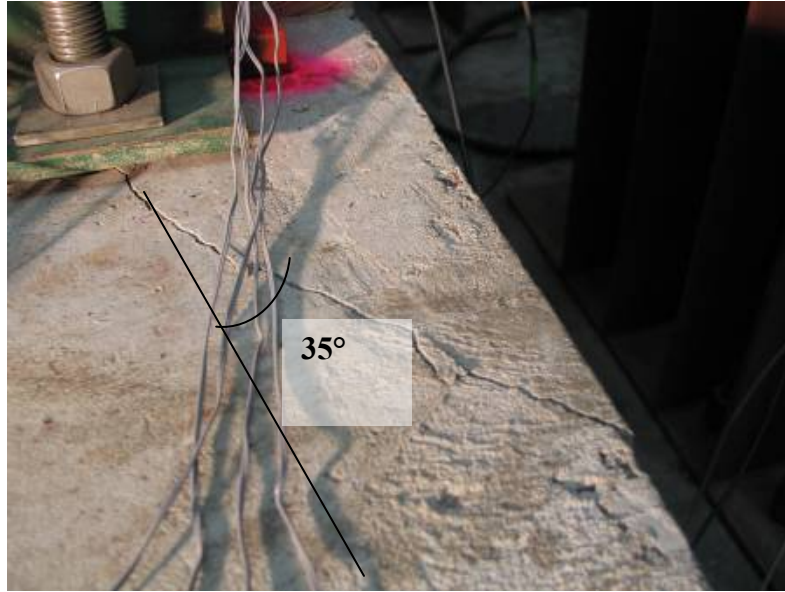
Failure surface of reinforced concrete cap beam subjected to shear loading with bolt close to edge during test P1-1
